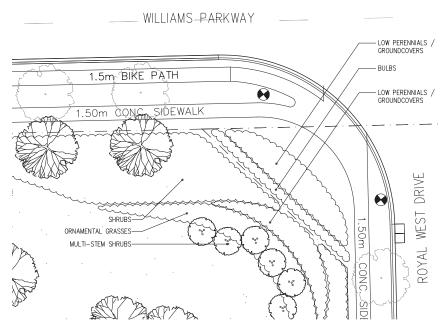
Community Gateway Element - Landscape Block behind daylight triangle - Concept Plan
